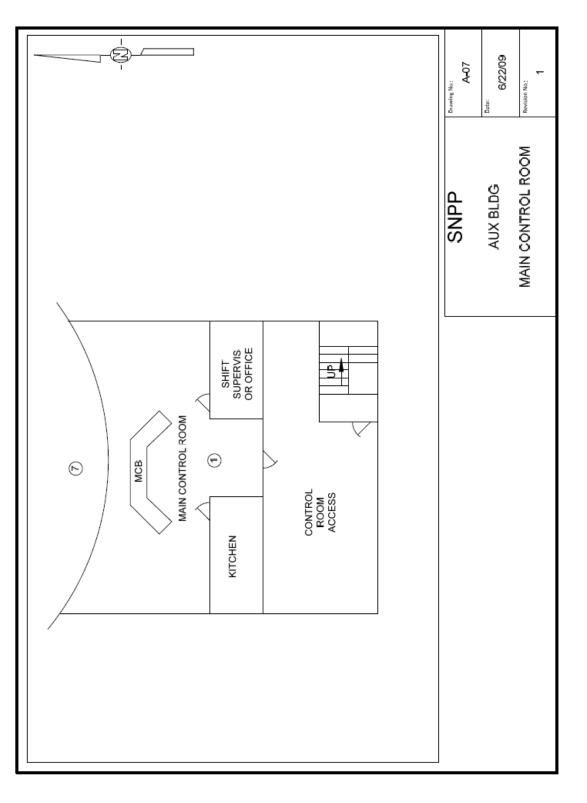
Auxiliary Building – Elevation +20 Ft.
